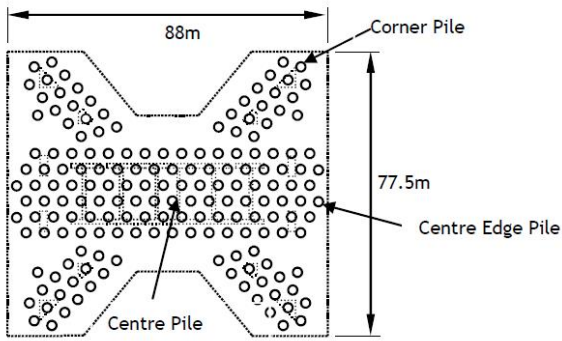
Pile Layout Plan Incheon Tower (Abdelrazaq et al., 2011).
